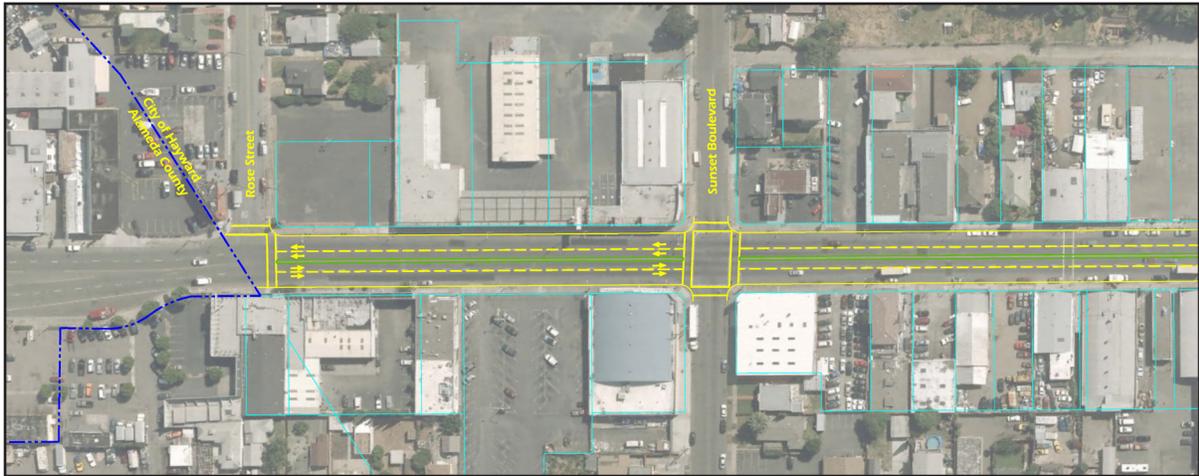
Mission Boulevard, Rose Street to Sunset Boulevard
